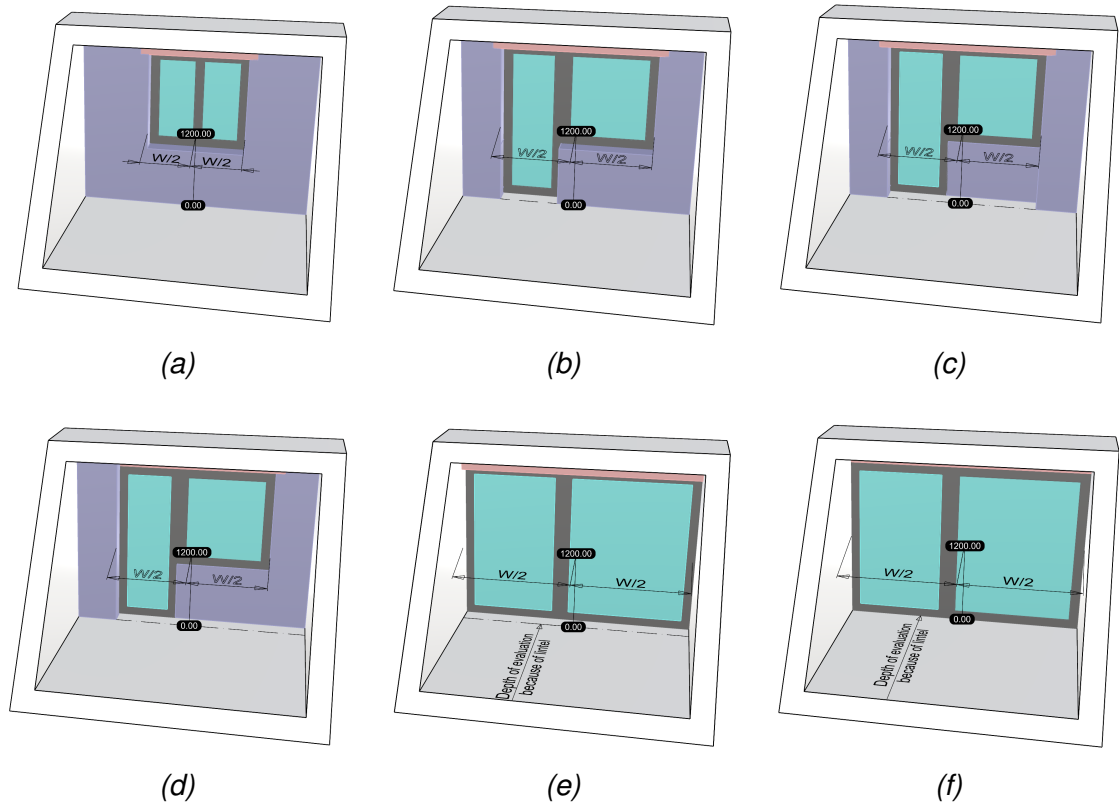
A graphical depiction of possible setups. a) Normal size window in a wall with constant thickness. b) Balcony door next to a window in a wall with constant thickness. c) Balcony door next to a window in with parapet wall thinner than the rest of the wall. d) Balcony door next to a window in with thicker wall on one end of the opening. e) Window throughout the whole width of the room with narrow or no lintel above opening. f) Window throughout the whole width of the room with narrow or no lintel above opening.
